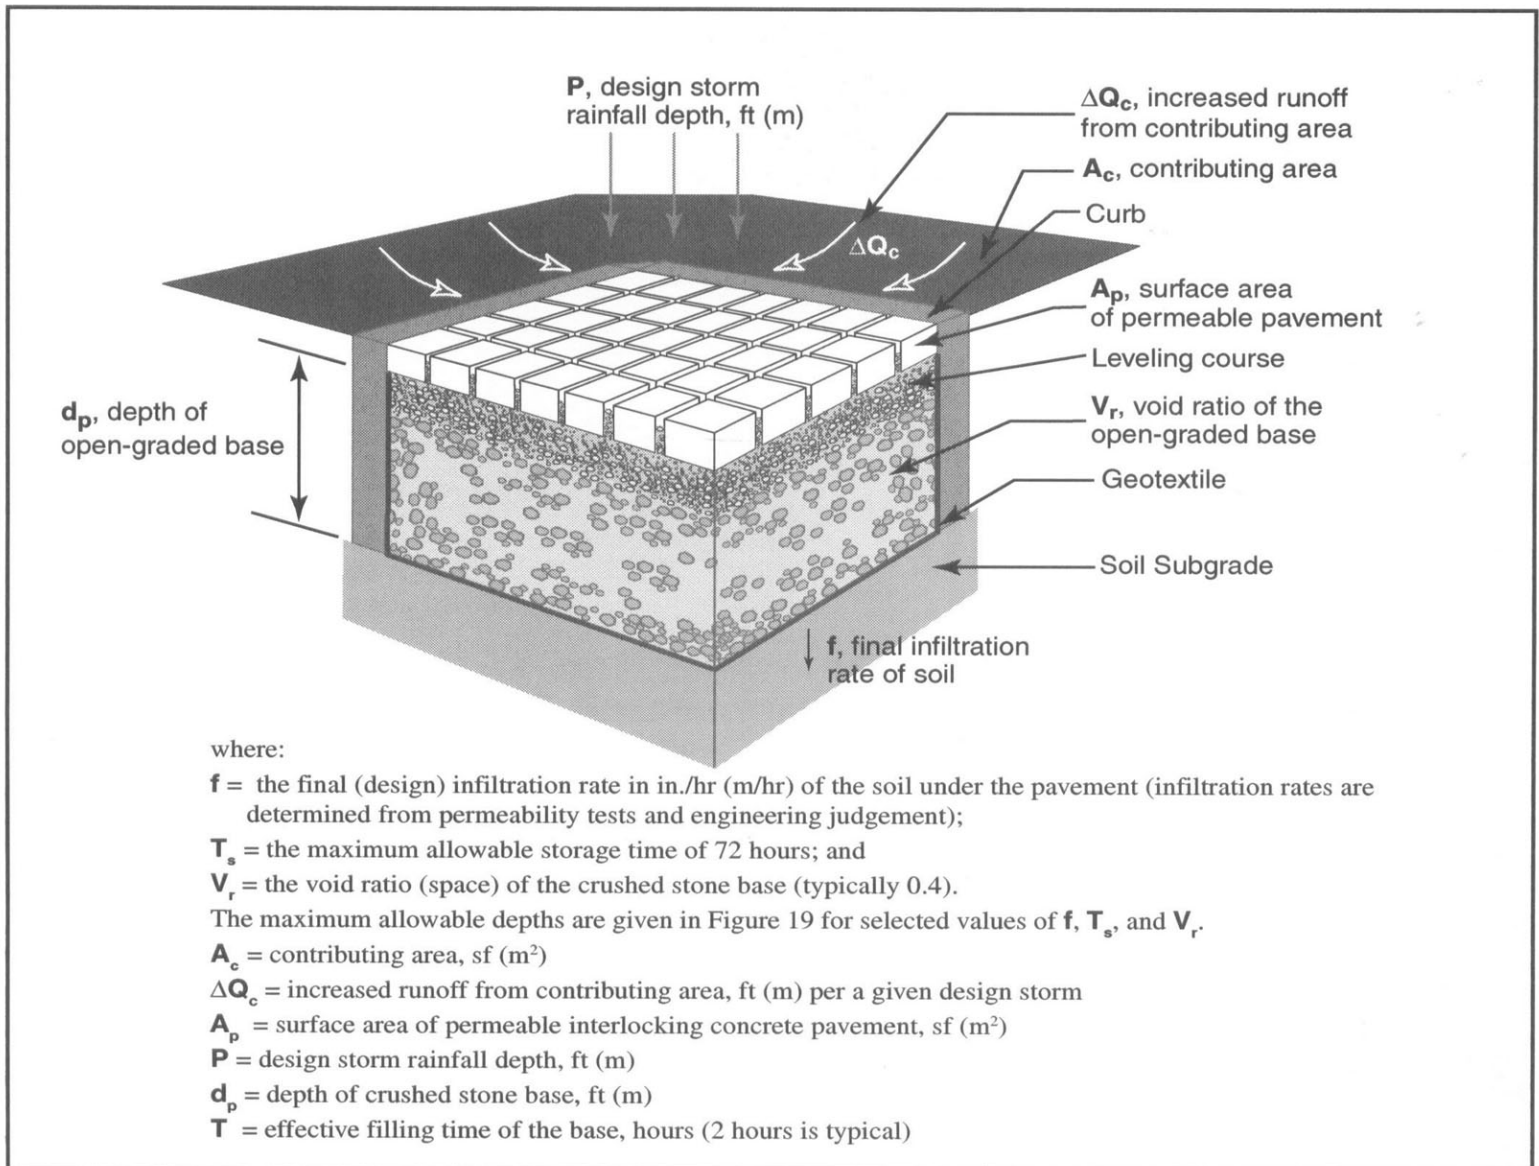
Design parameters for calculating the base depth for permeable interlocking concrete pavements.
